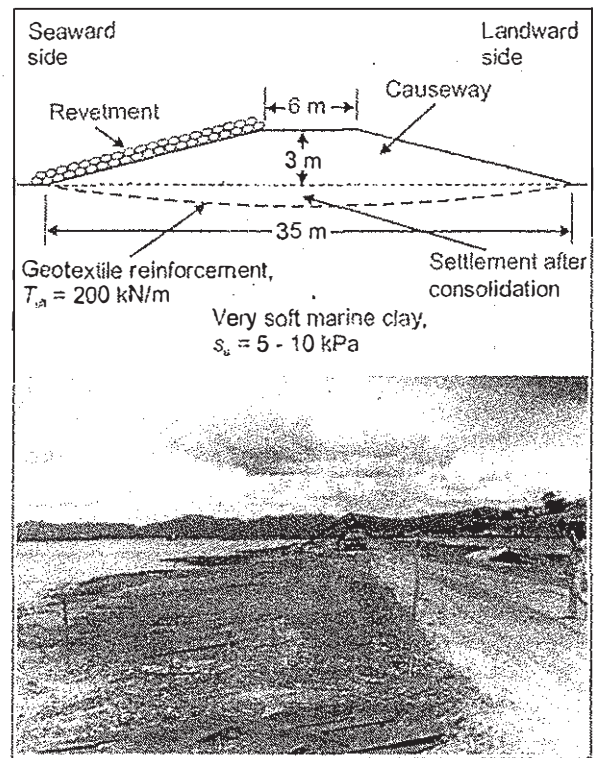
Basal reinforced causeway, Deep Bay, Hong Kong, 1982.
